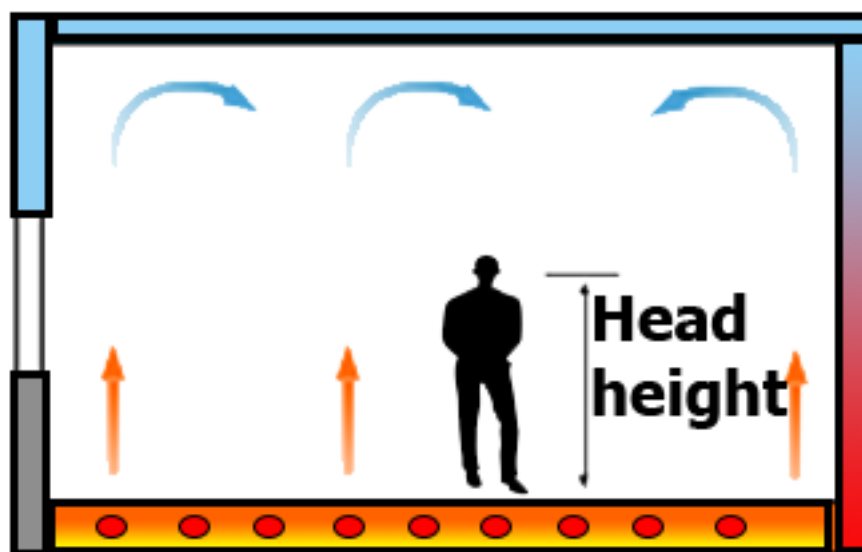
UNDERFLOOR HEATING (CREDIT BY © STAM S.R.L.)
